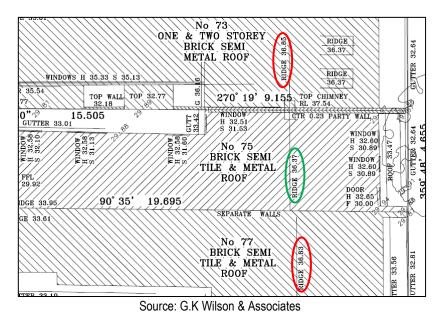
Extract of the Survey Plan and Adjoining Ridge Heights
